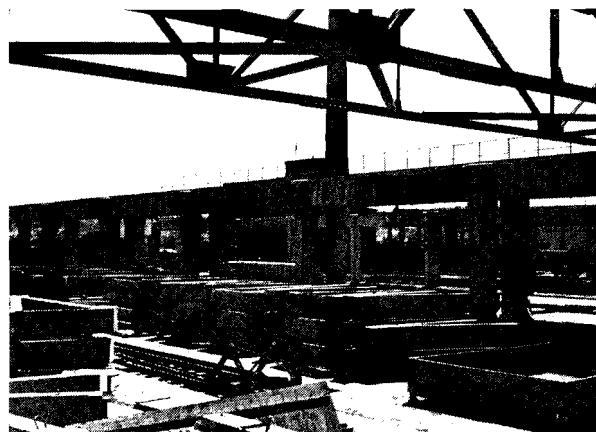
View of a concrete factory for precasting structural units for industrial buildings.
